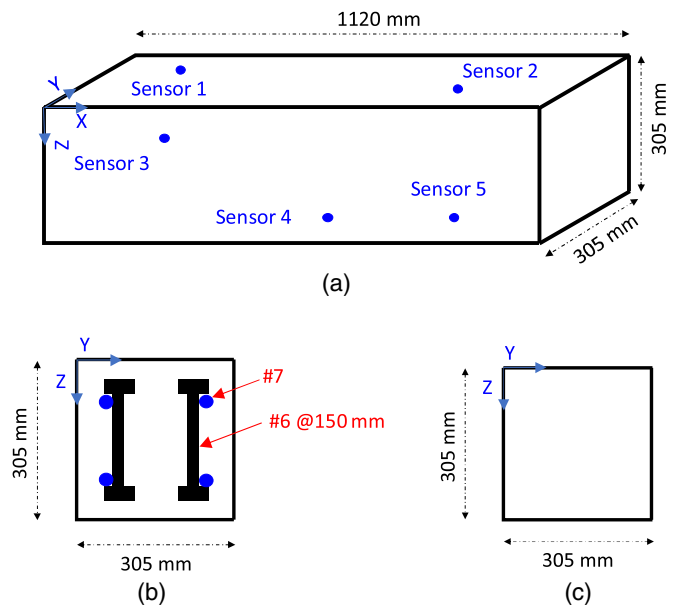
Dimension and sensor layout of medium-scale specimens: (a) medium-scale specimens; (b) specimen section for the confined specimen; and (c) specimen section for the unconfined specimen.
